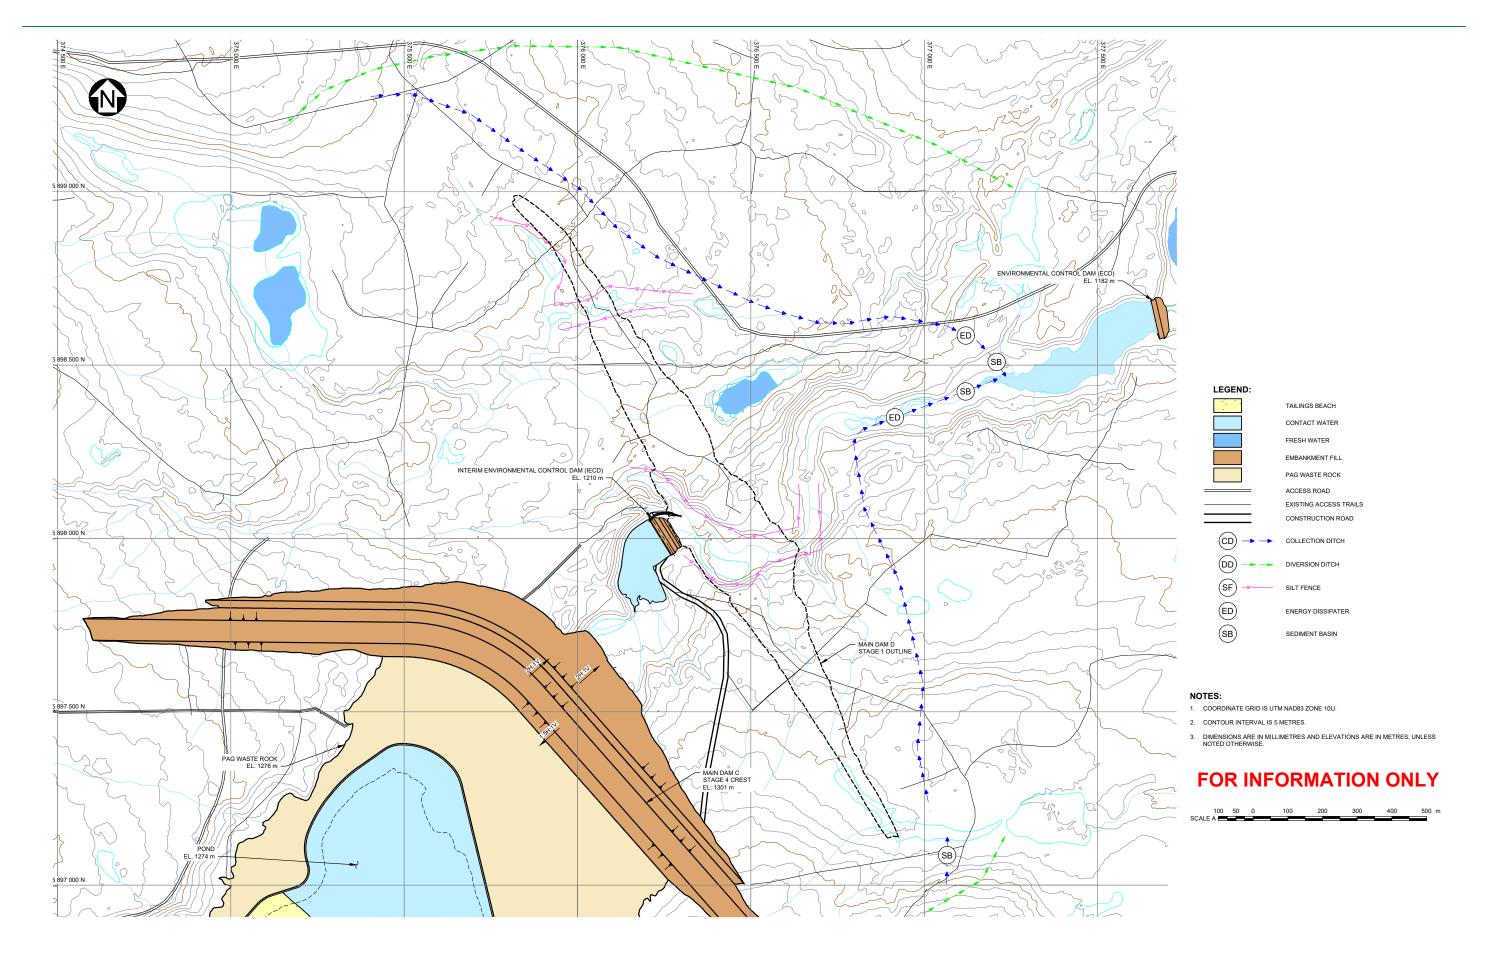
Main Dam D Stage 1 Construction (Year +5) – Erosion and Sediment Control Plan
